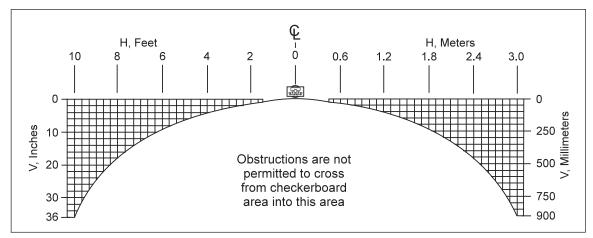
Obstruction area to umbrella pattern along the mounting wall of extended-coverage sidewall Nonstorage sprinklers
